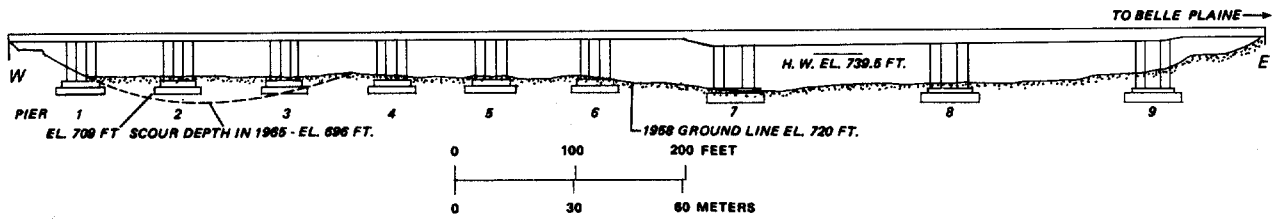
Elevation sketch of US-169 bridge, showing scour depth as measured after the 1965 flood.
